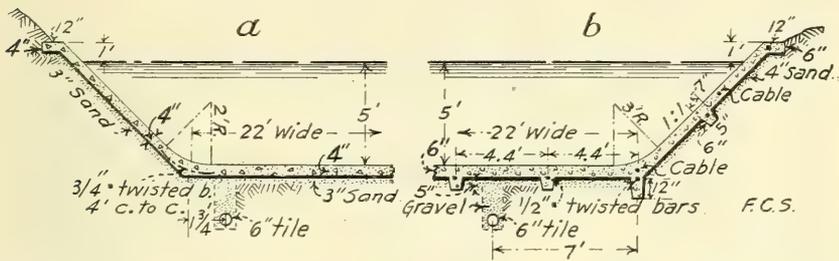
(a) General type of concrete lining construction used for Davis and Weber Counties Canal, Ogden, Utah. (b) Type of concrete lining used for weak foundations on the same canal.
